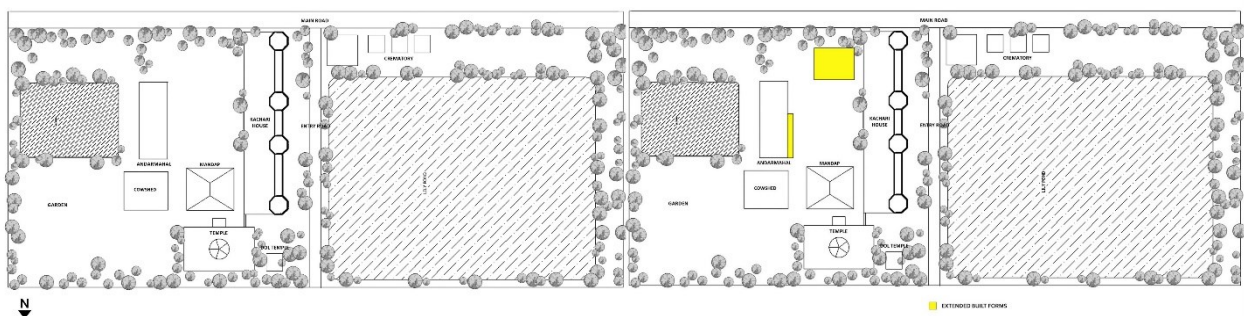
Original Roof Plan (left) and Existing Roof Plan (right) (Source: Author).
